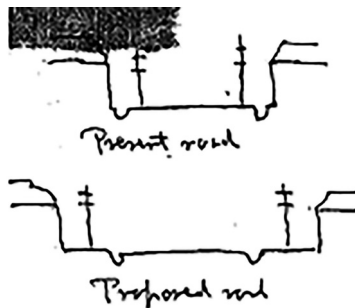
Drawing of existing and proposed road design for Purabsarai road in Monghyr. The electric poles were moved from the road to the pavement in the proposal. For the Purabsarai road, 0.682 acres had been set aside.
